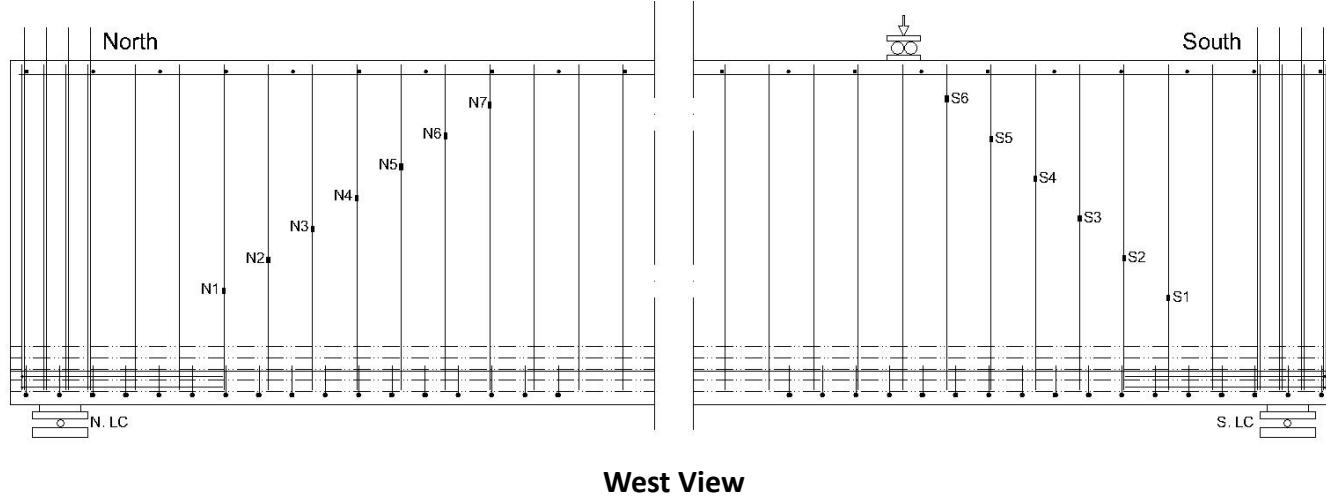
Layout of Strain Gauges on Transverse Reinforcement for Girder E2-South End Testing (Labib 2012)
